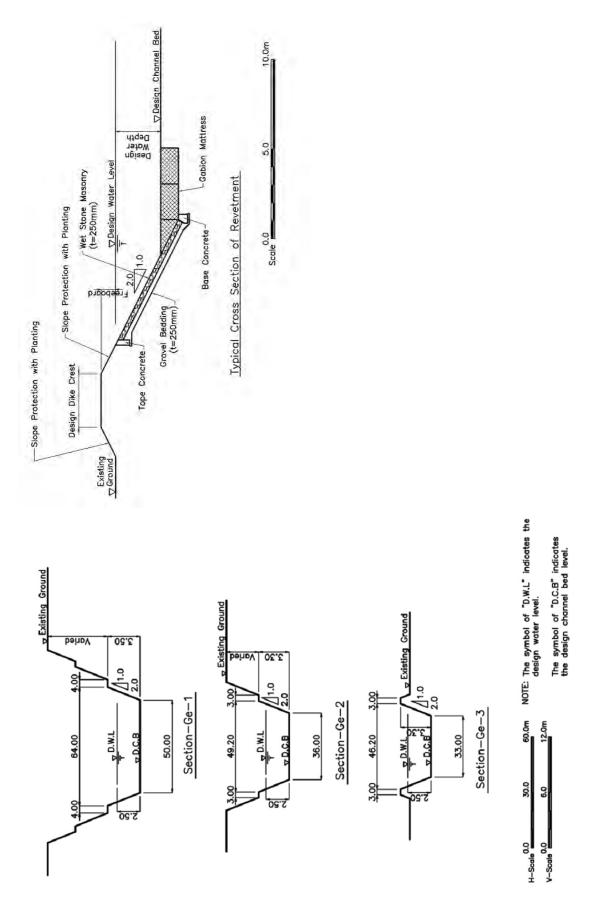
Proposed Typical Cross Sections and Revetment of the Gelman Darreh-Madarsoo River
